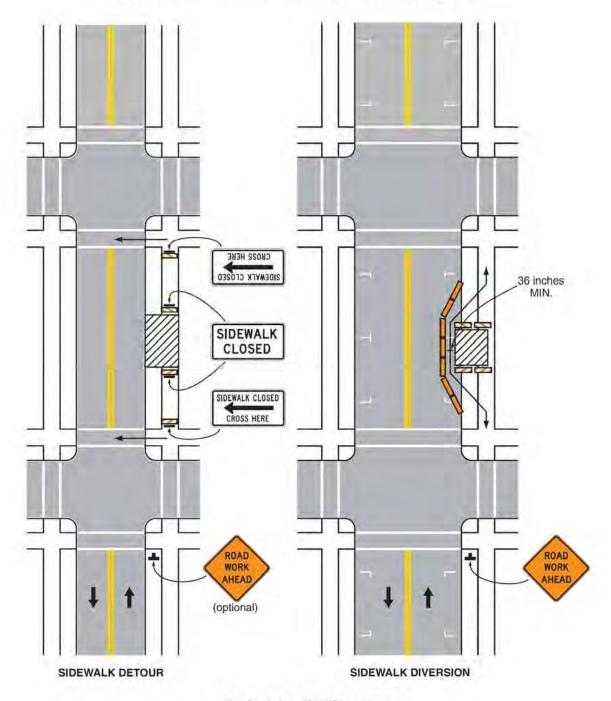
H-28. Sidewalk Detour or Diversion (TA-28)
